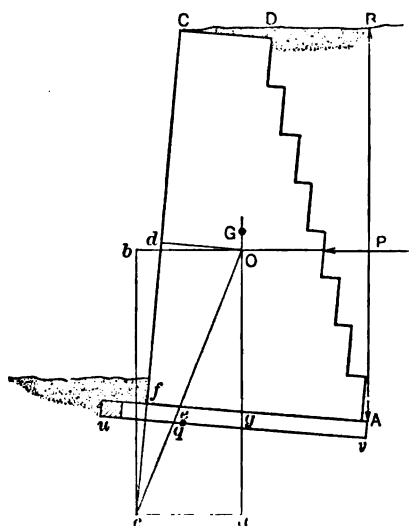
EQUILIBRIUM OF RETAINING WALL.
